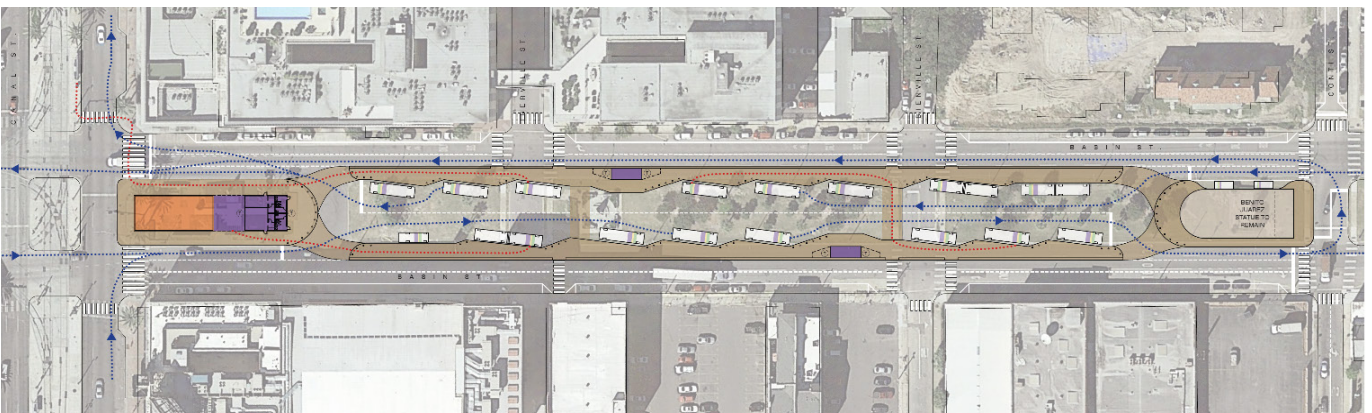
BASIN STREET LAYOUT CONCEPT REFINEMENT (OPTION A) - TWO-BLOCK, SIDE PLATFORMS FACILITY
